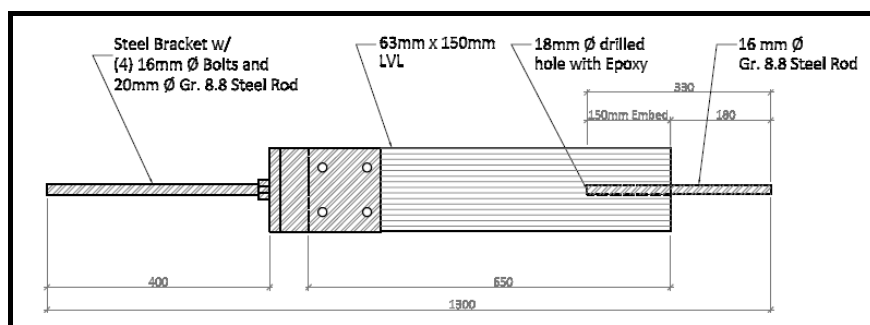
Epoxy Furnace Test Specimen Schematic Drawing
